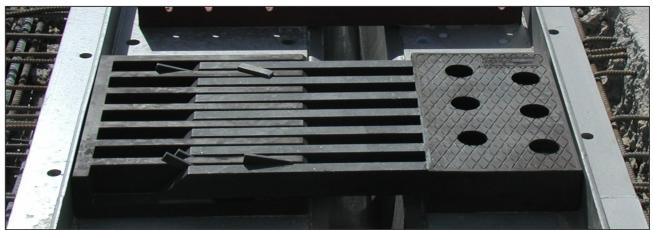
Anchoring of Tensa[®]Flex Fingers on steel substructure
